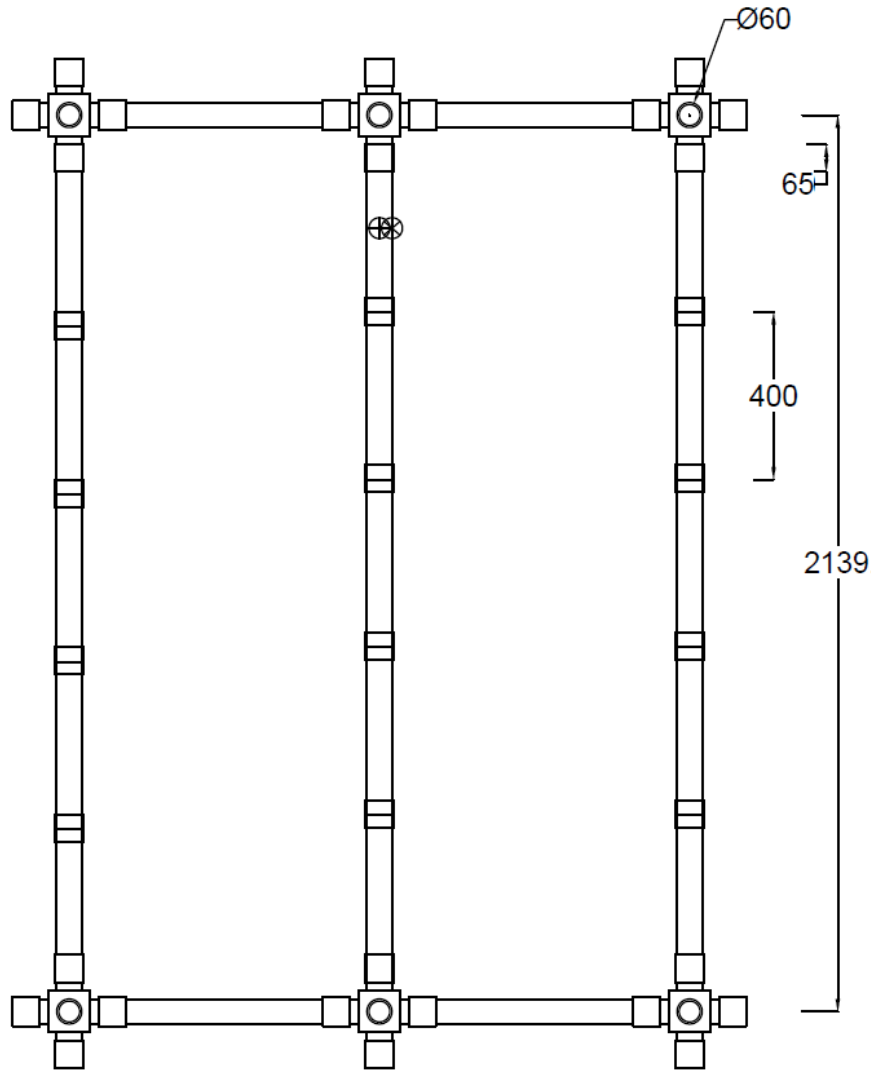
Elevation of the structural frame. All dimensions are in mm.
